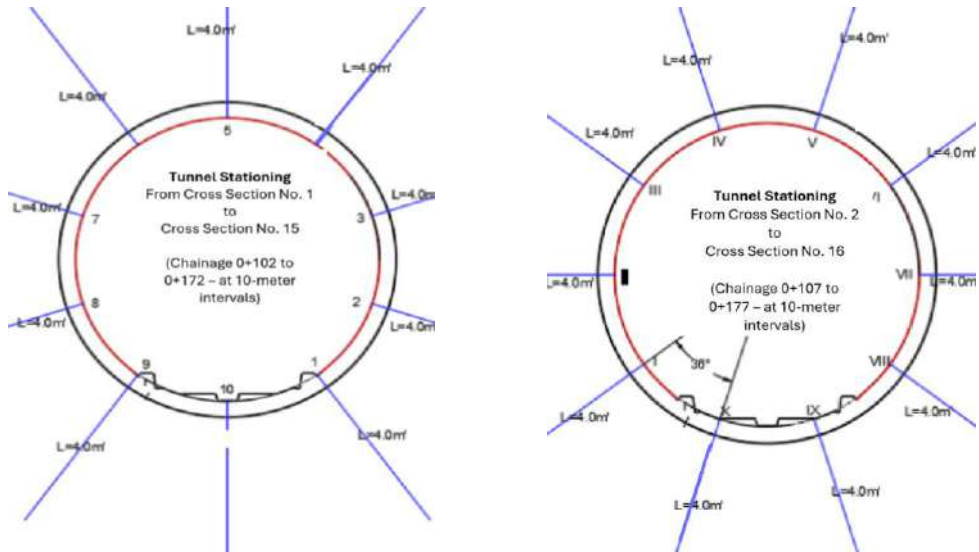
Layout of tension grouting injection boreholes (profiles at Work Site 1).
